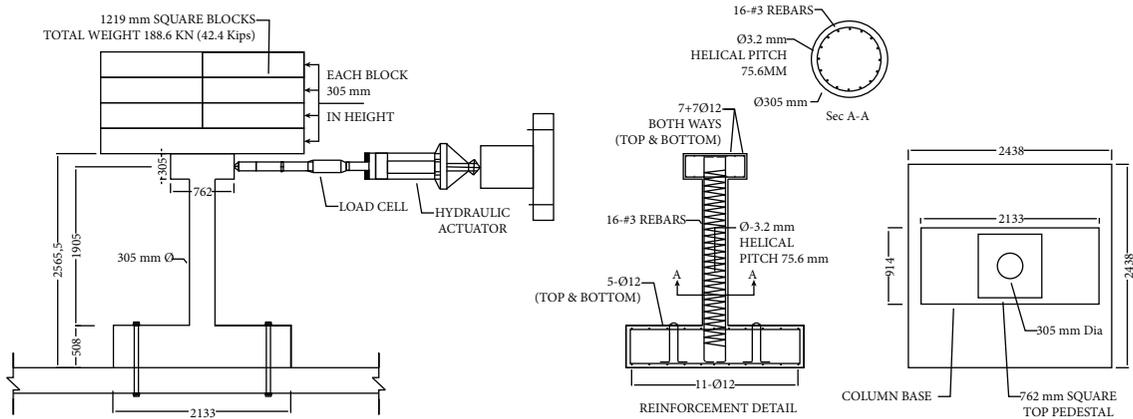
Investigational arrangement explaining the specimen sizes with top dead load arrangement and details of reinforcement used.
